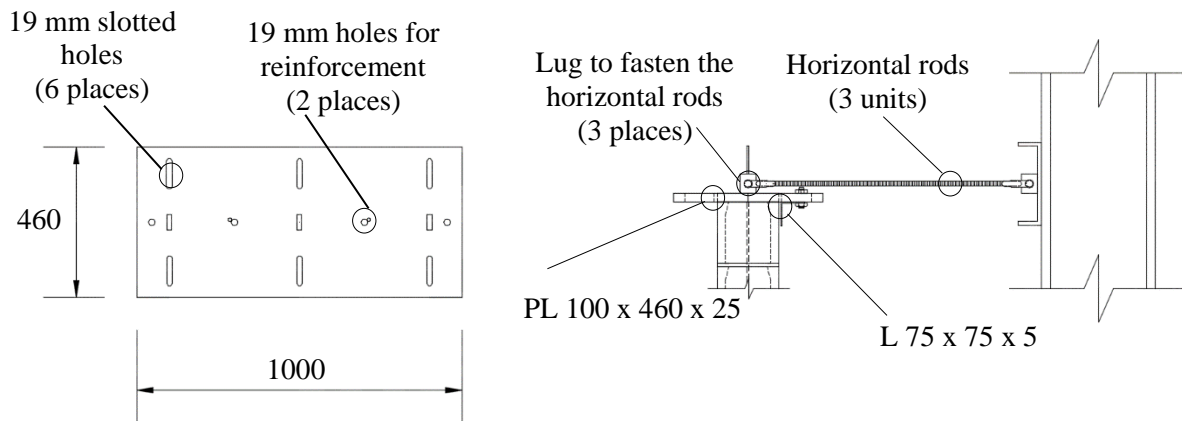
Top wall support, showing plan view of top plate and an elevation of the entire support assembly (dimensions in mm).
